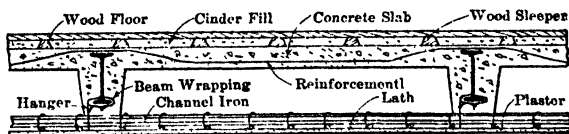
Directly Attached Typical Fire-proof Floor and Ceiling-construction
